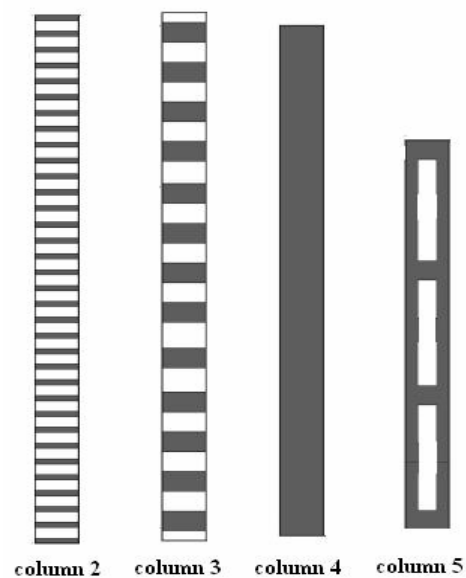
Steel strap and plate arrangements of strengthened specimens
